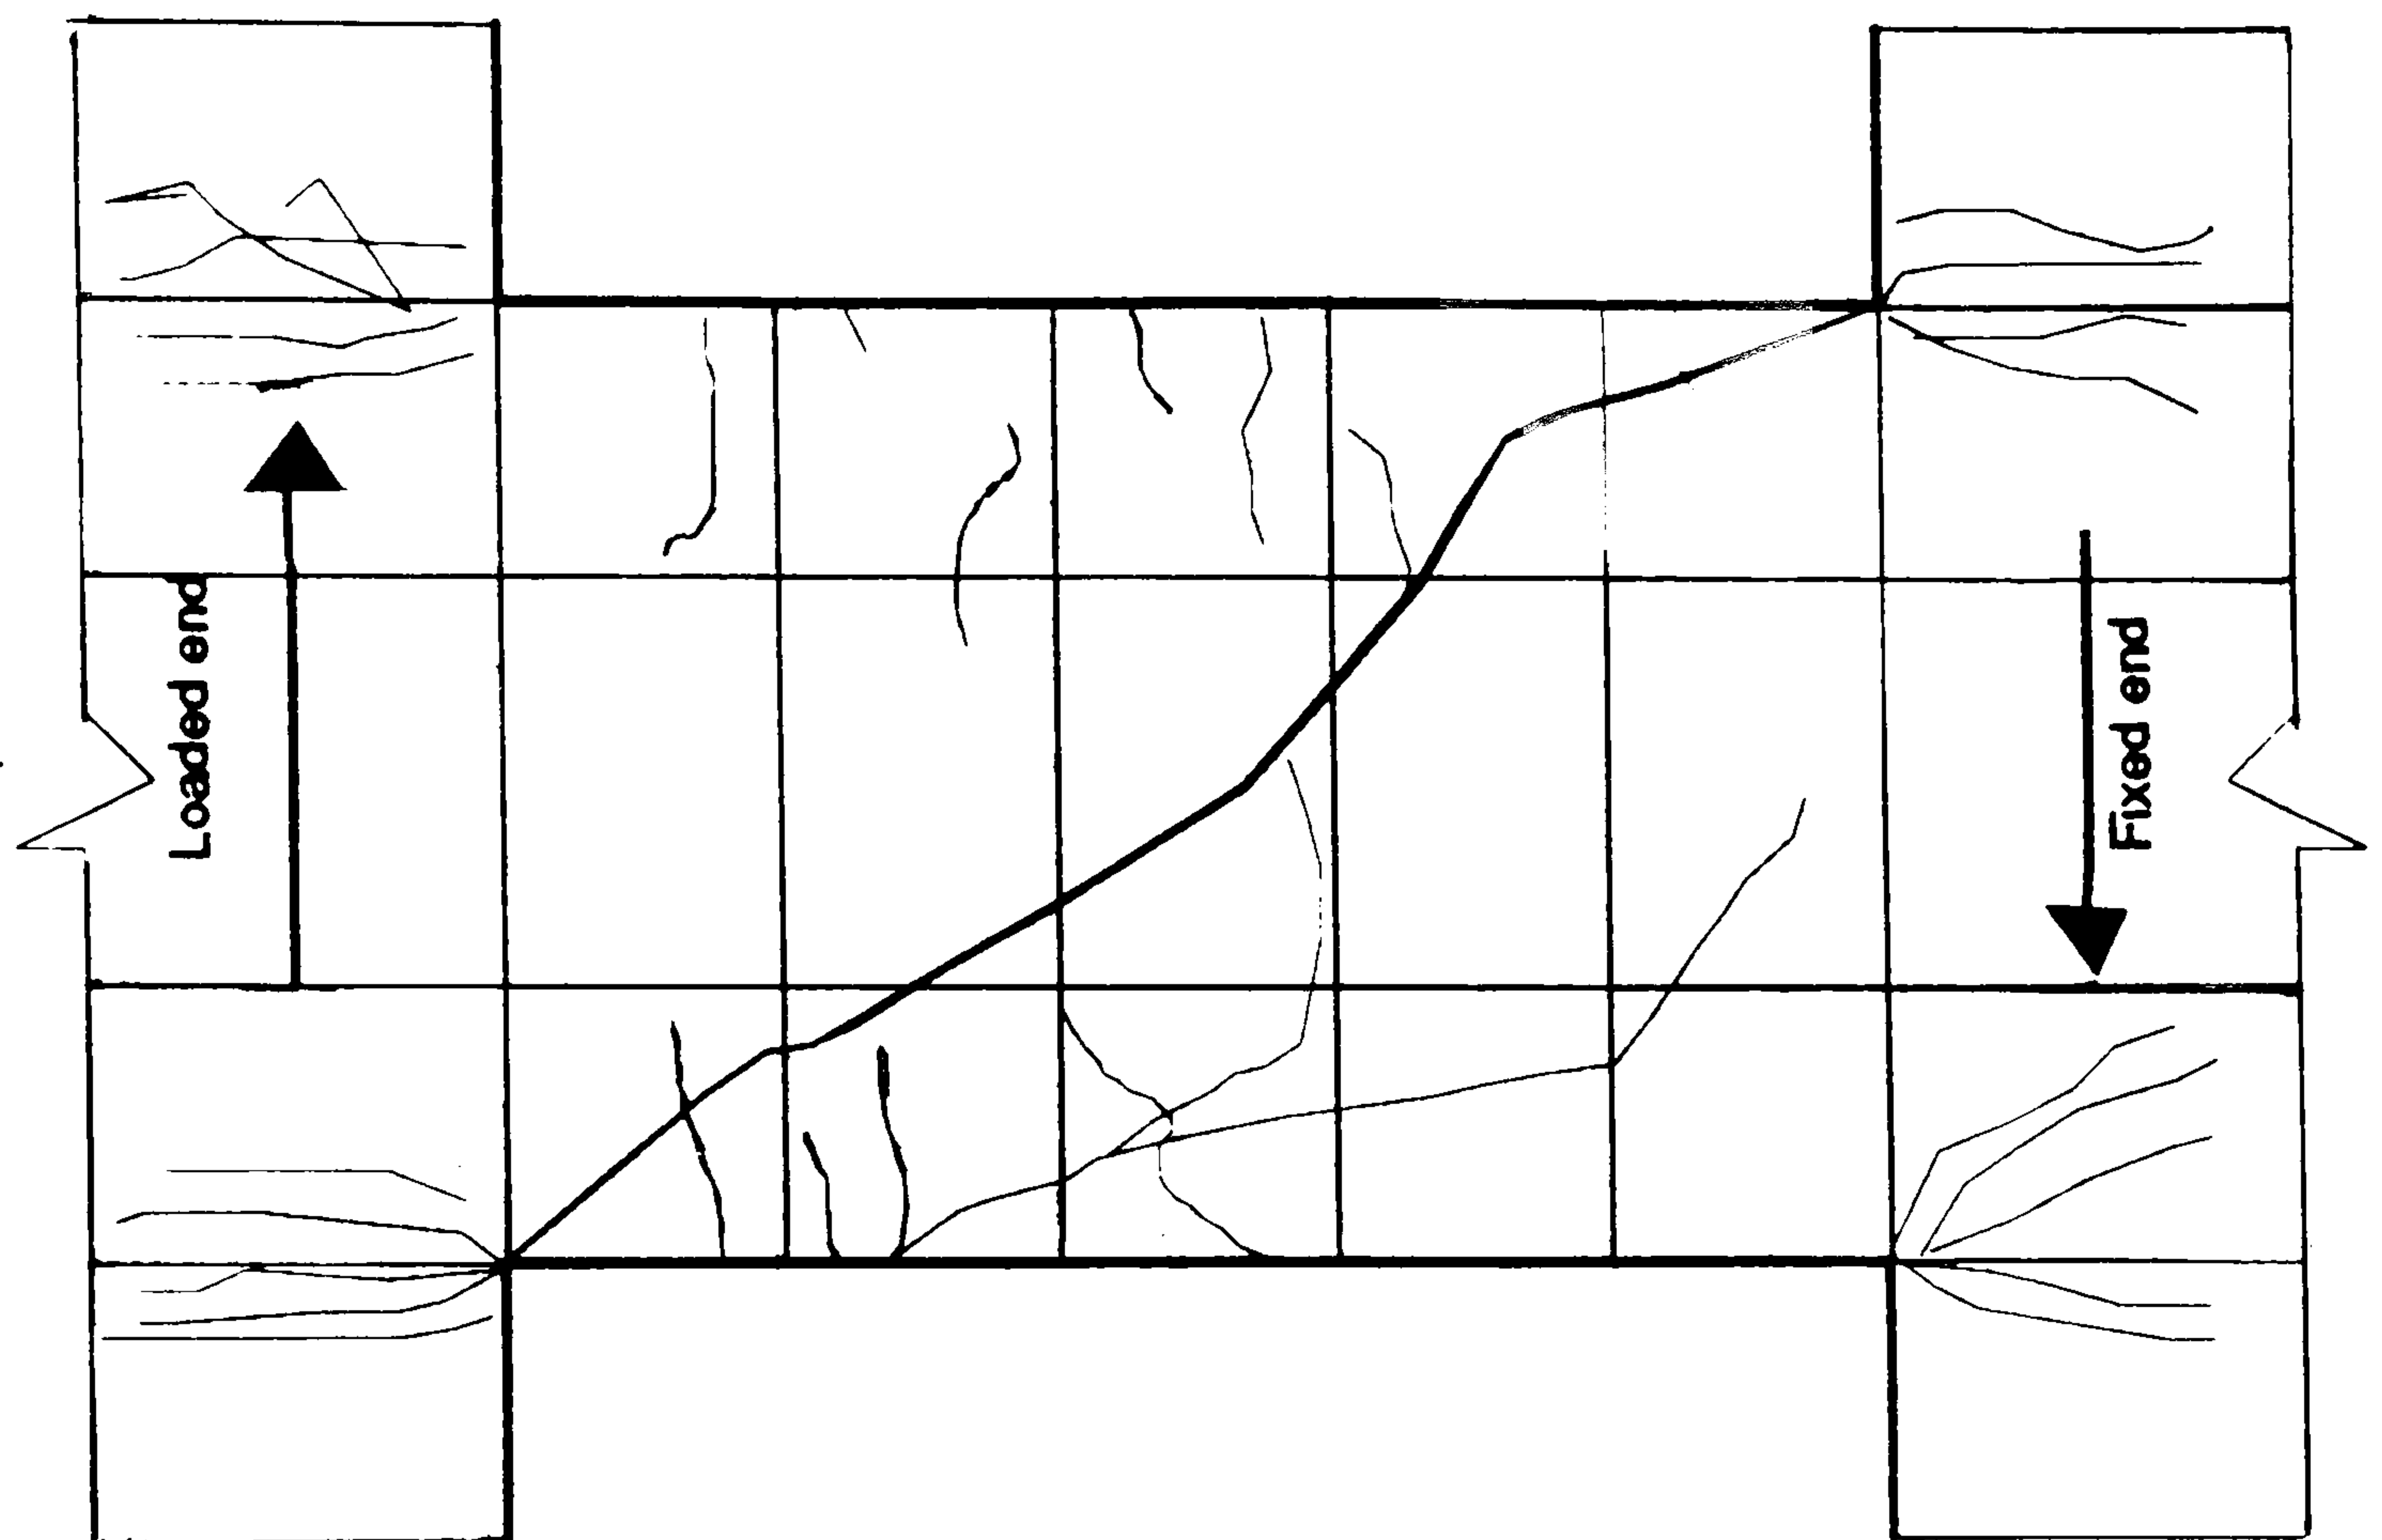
Failure mechanism and crack pattern for beam EBD1
